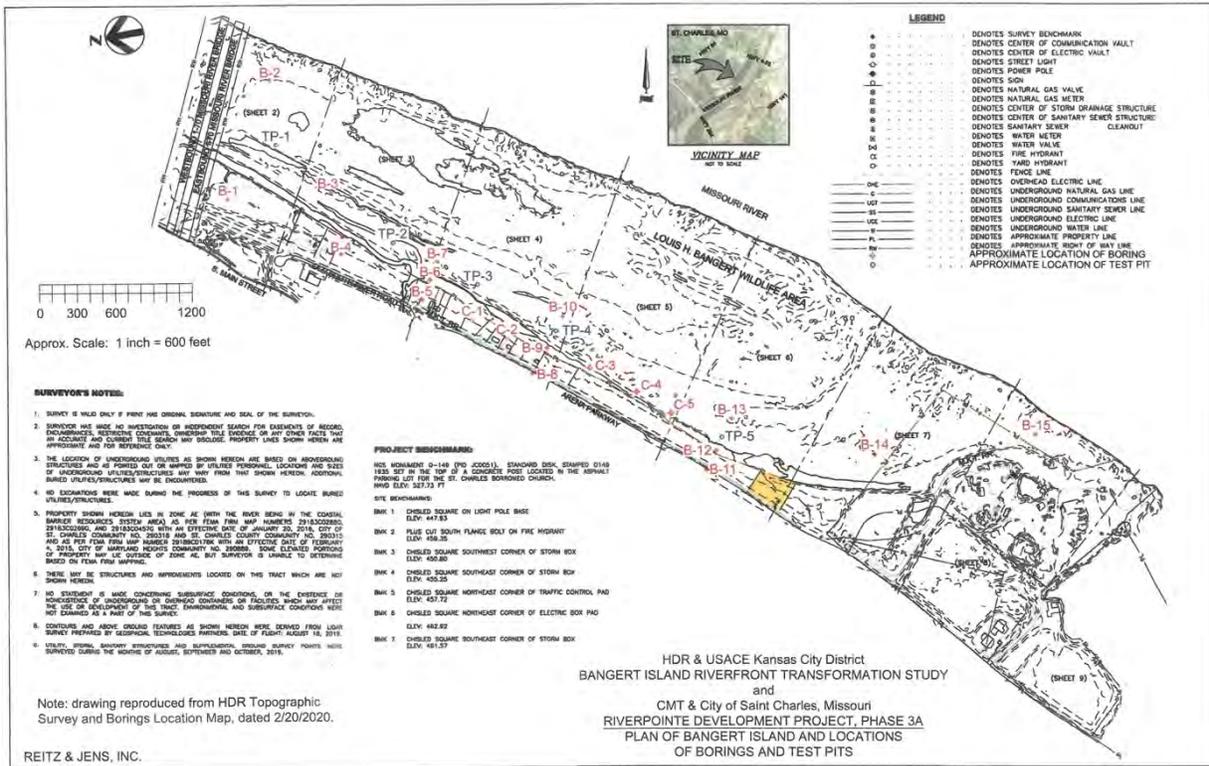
Plan map showing locations of borings (B- and C-) and test pits (TP-).
